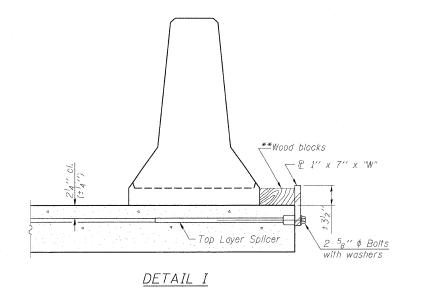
Detail I - With Bar Splicer or Couplers: Connect one (1) 1''x7''x10'' steel P to the top layer of couplers with 2-58" \$\phi\$ bolts screwed to coupler at approximate © of each barrier panel.
